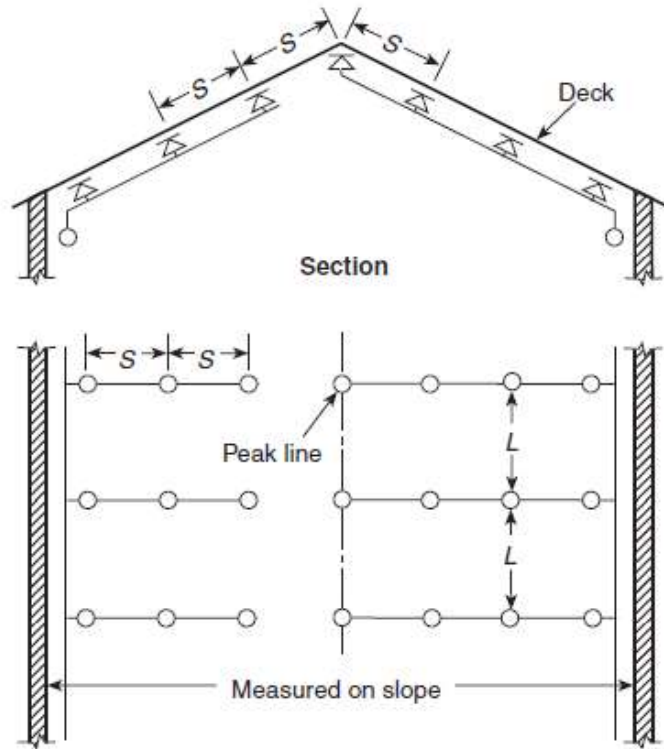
(a) Sprinklers Under Pitched Roofs with Sprinkler Directly Under Peak; Branch Lines Run Up the Slope.
